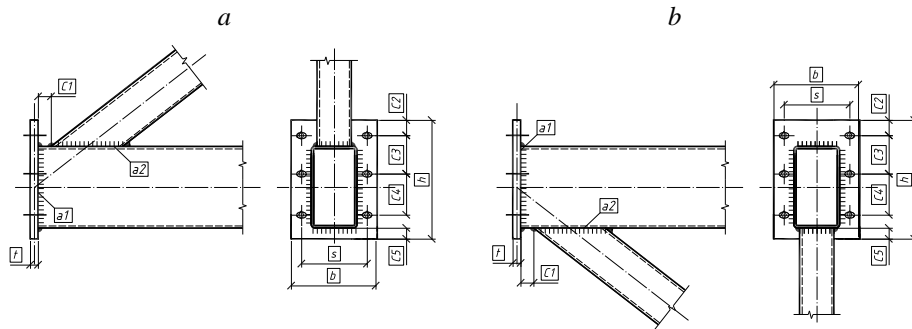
Support joints in trusses with elements made of rectangular (square) hollow sections
